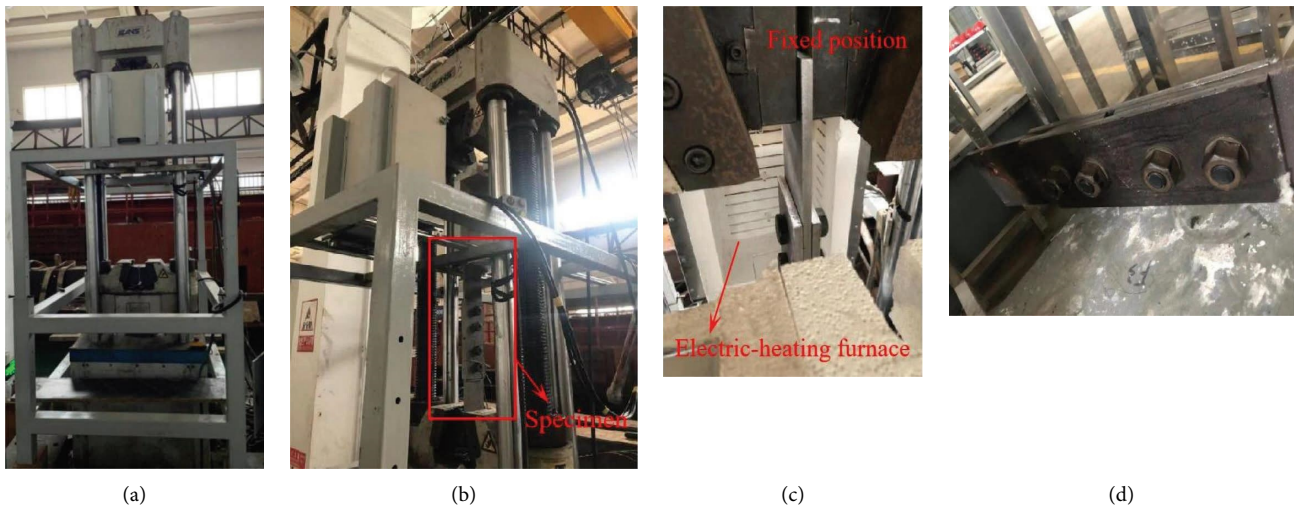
MTS high-temperature testing machine and the specimen at elevated temperatures. (a) A testing machine. (b) Installation of the specimen. (c) Local details. (d) Details of the specimen.
